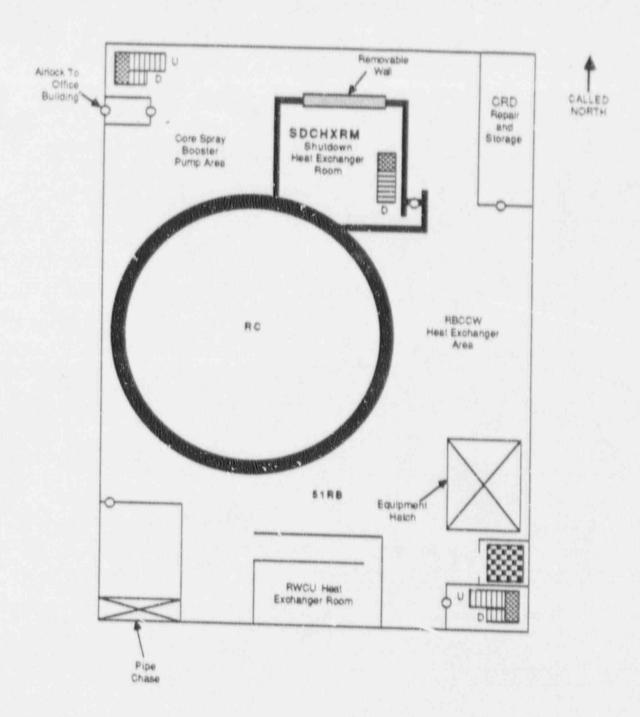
Oyster Creek Reactor Building - Elevation 51'-3"
